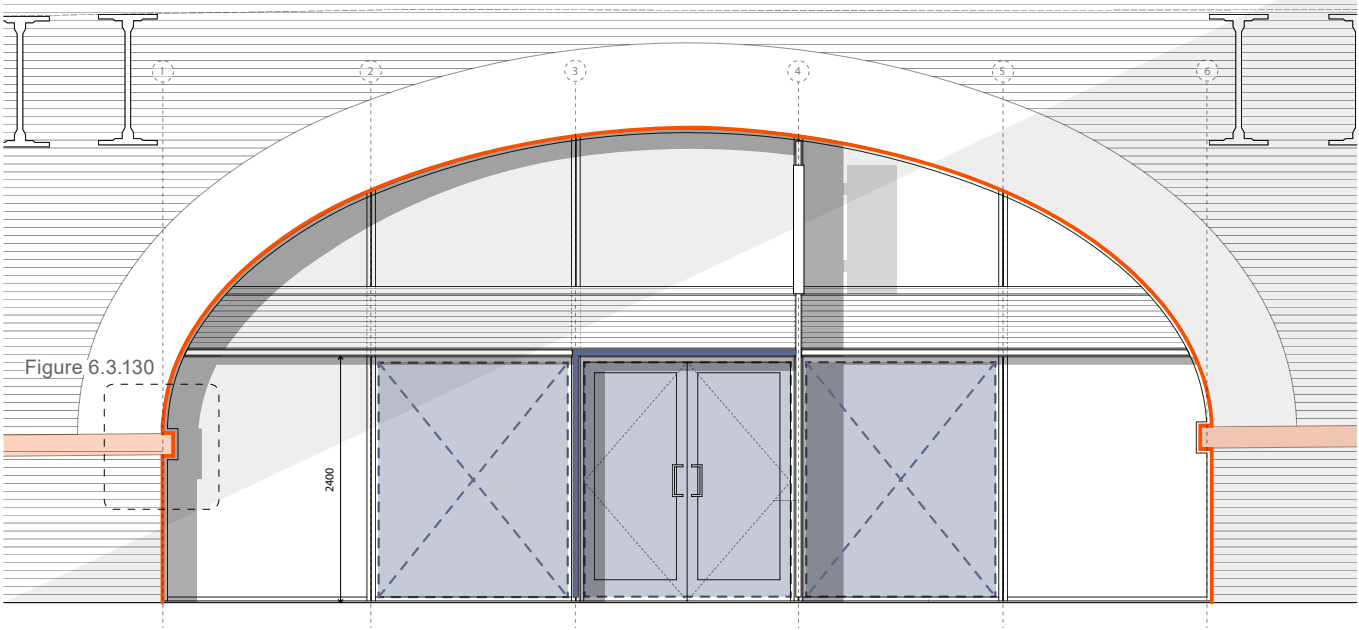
Elevation: Designated doorway zones for A1 and A3 units
